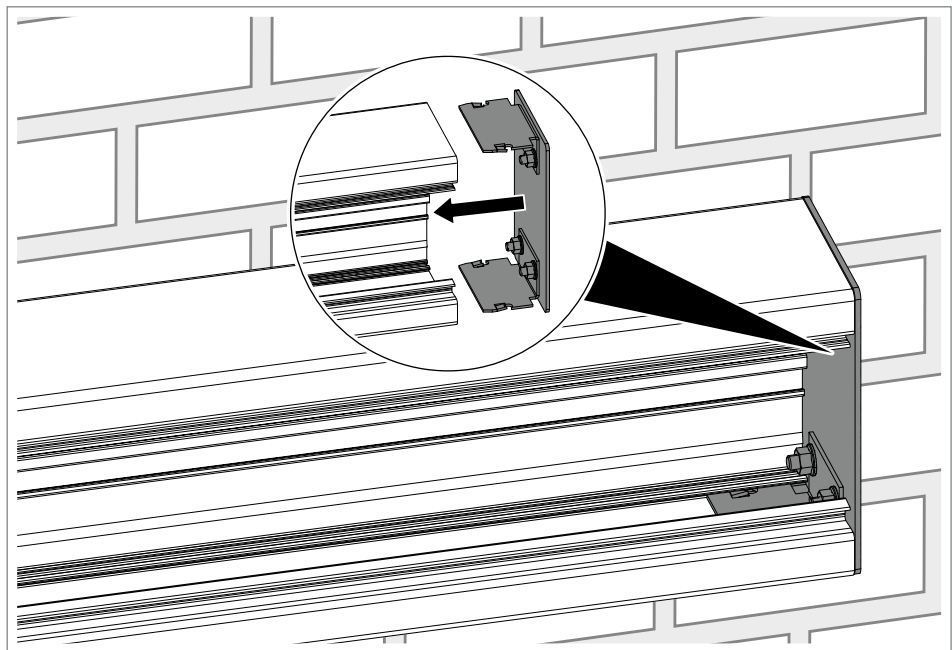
Mounting the end piece (device installation trunking Rapid 80® GA)
